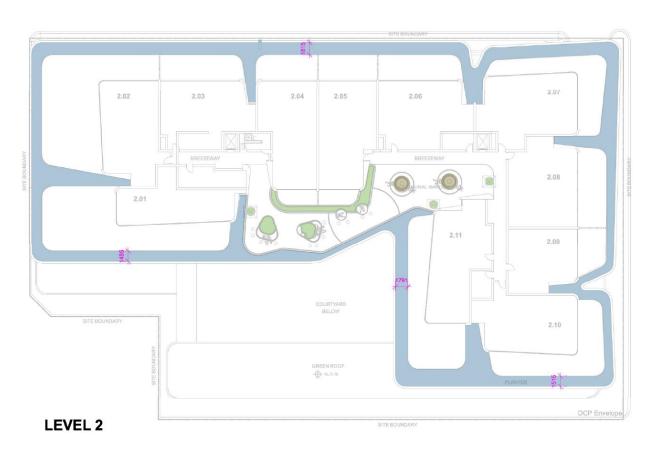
Proposed soil depths for Levels 2 (Source: Site Design + Studios)
